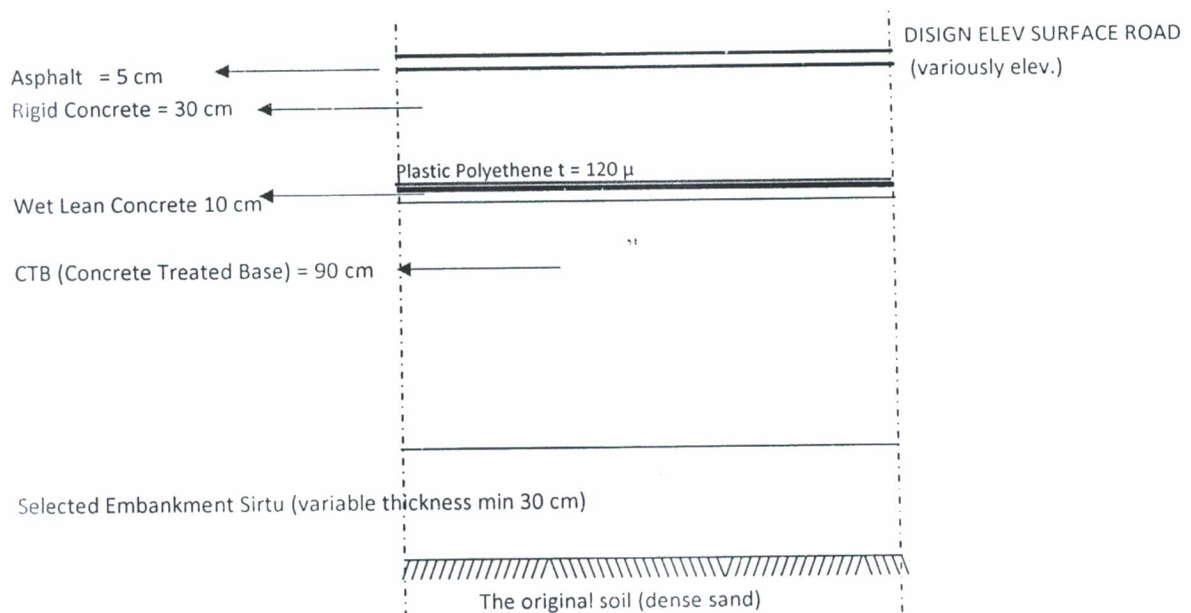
The General Proposed road construction in STA 7+820 JICT
